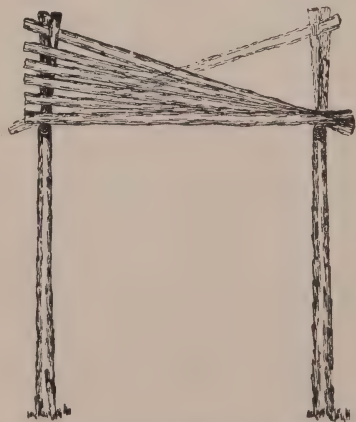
Side Elevation of Pergola with Alternated Roof
